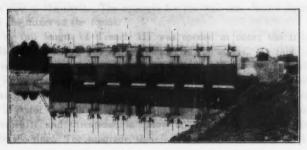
MAIN CANAL. CHECK AND WASTEWAY.
